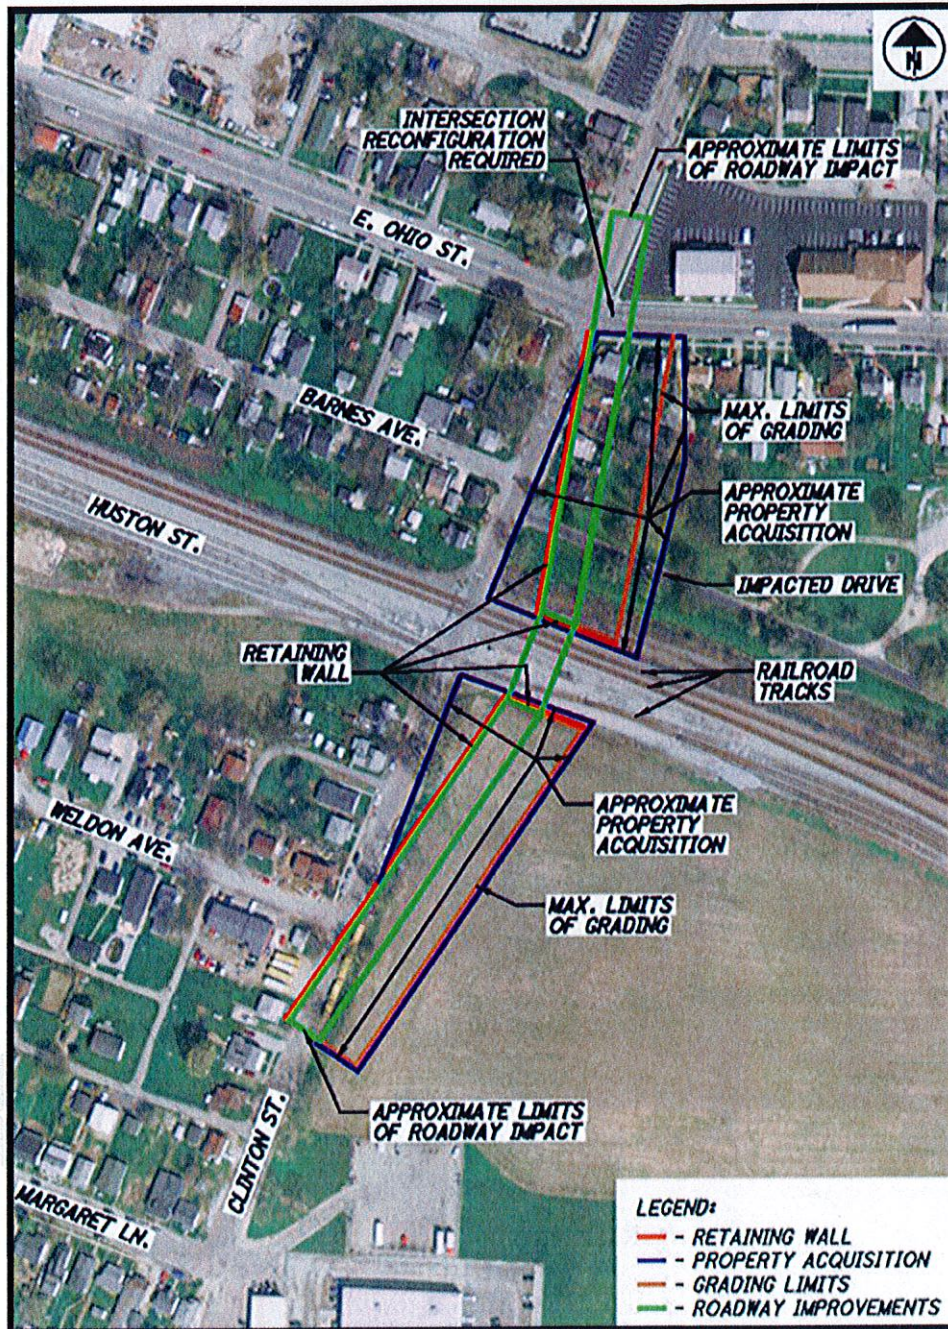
Location B – Clinton Street Grade-Separated Crossing Concept
